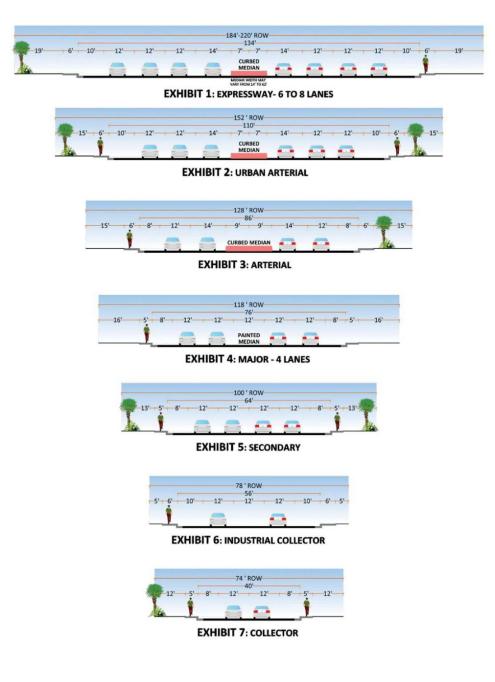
CITY OF JURUPA VALLEY GENERAL PLAN ROADWAY CROSS-SECTIONS
